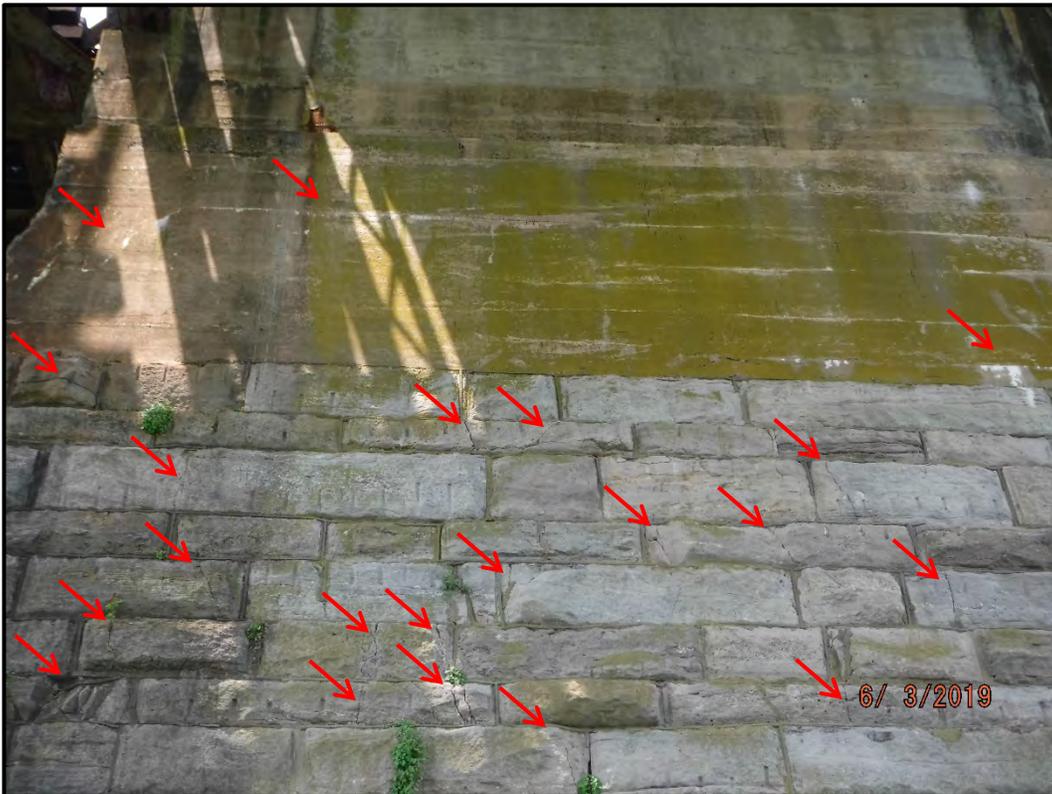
Minor cracking throughout the middle of the Pier 6 east face. Note the cracking with efflorescence on the face of the concrete pier cap.
